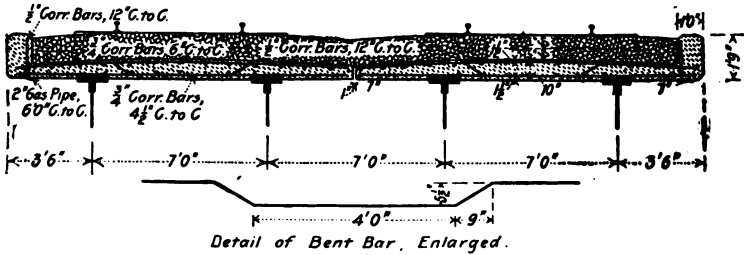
Floor for Deck Bridge, C. & E. I. Ry.
